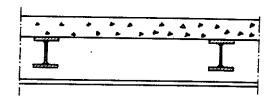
a. Steel girder floor construction with insulation in the form of a suspended ceiling
